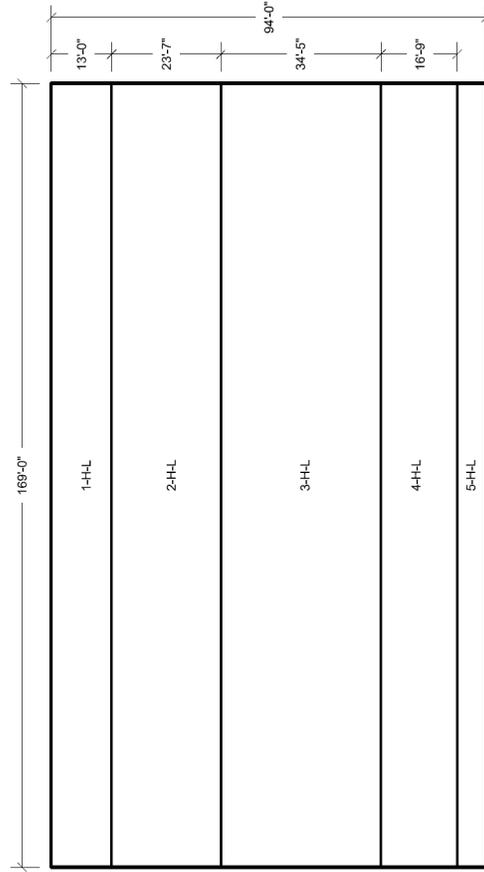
H.6-12c: PUMP HOUSE FOUNDATION MAT
